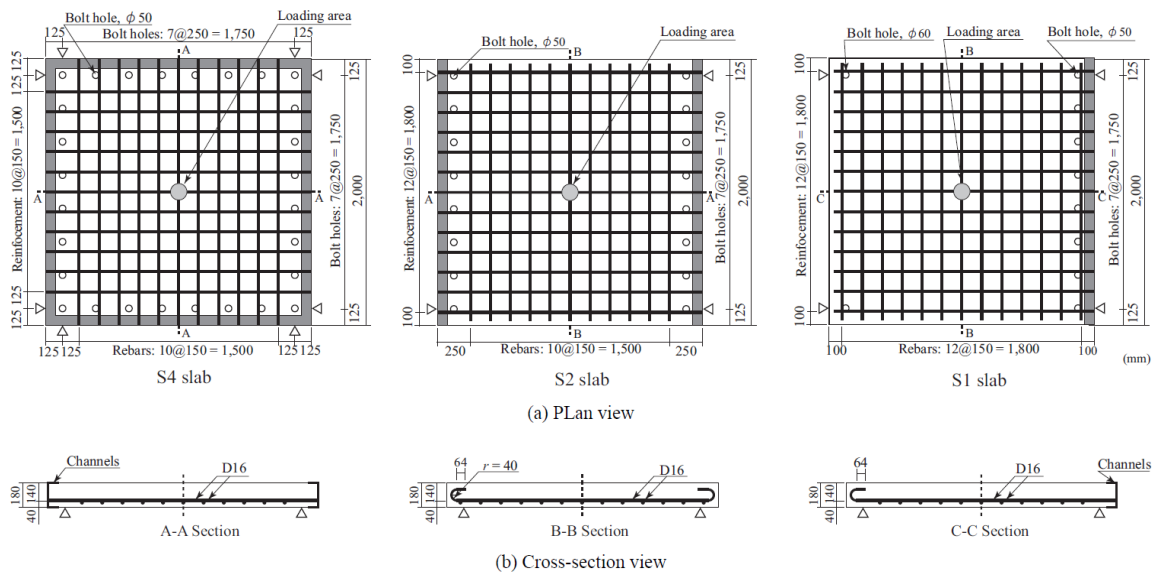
Dimensions, reinforcement layout and support conditions for each slab (Source: Kishi et al., 2011)
